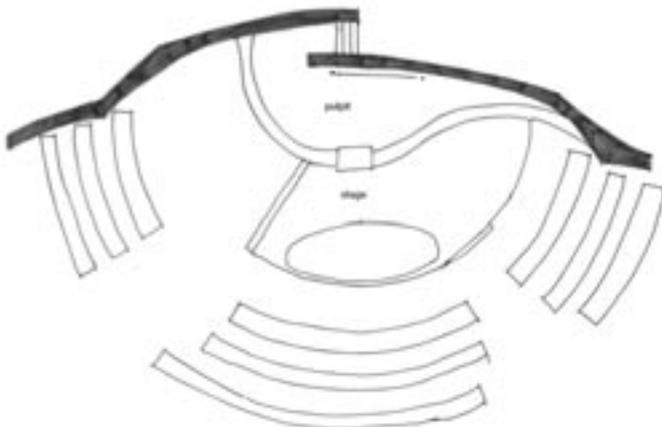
Plan of pulpit and stage of Fichardtkruin.
